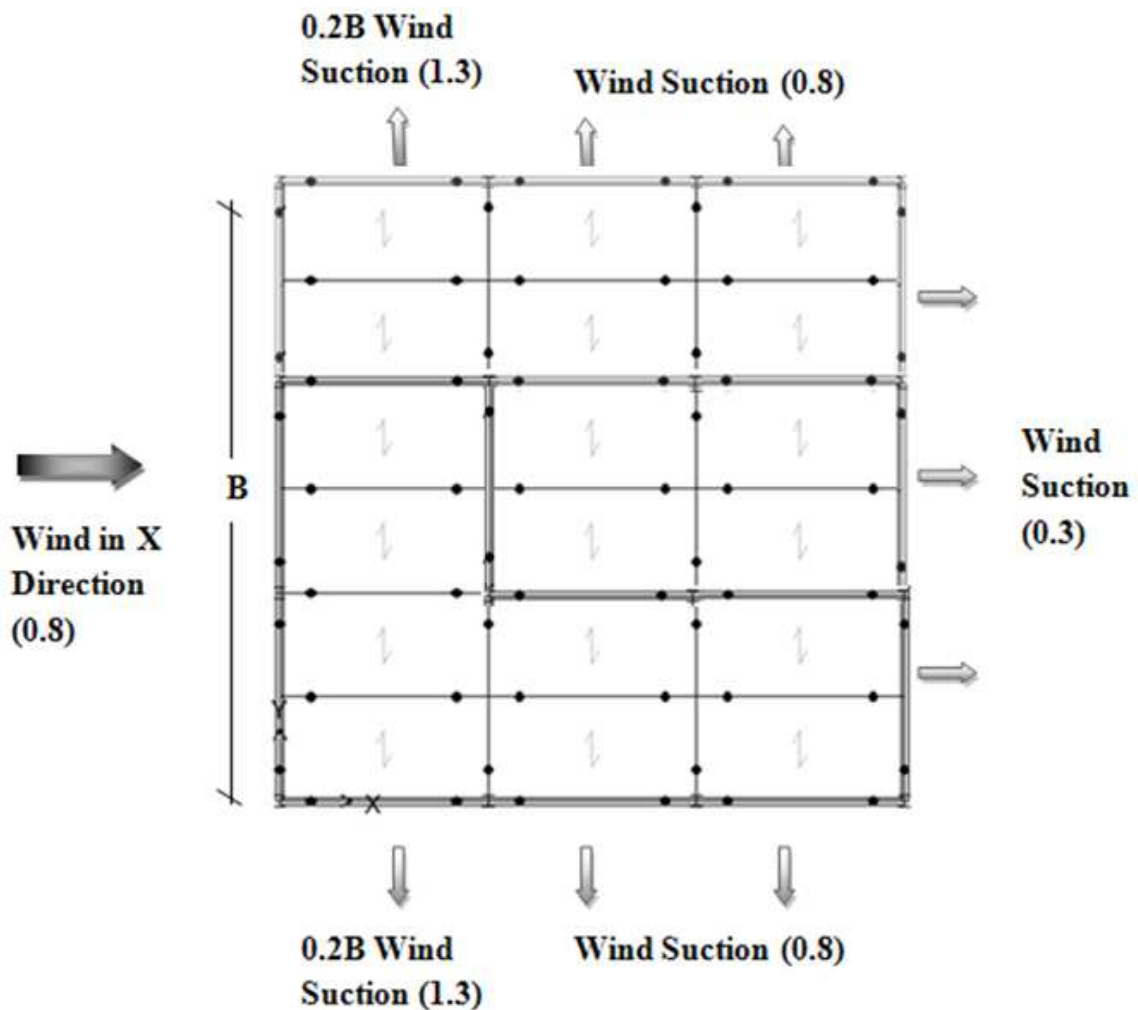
(a): Building layout indicating wind in X direction with suctions for symmetrical plan and asymmetrical section.
